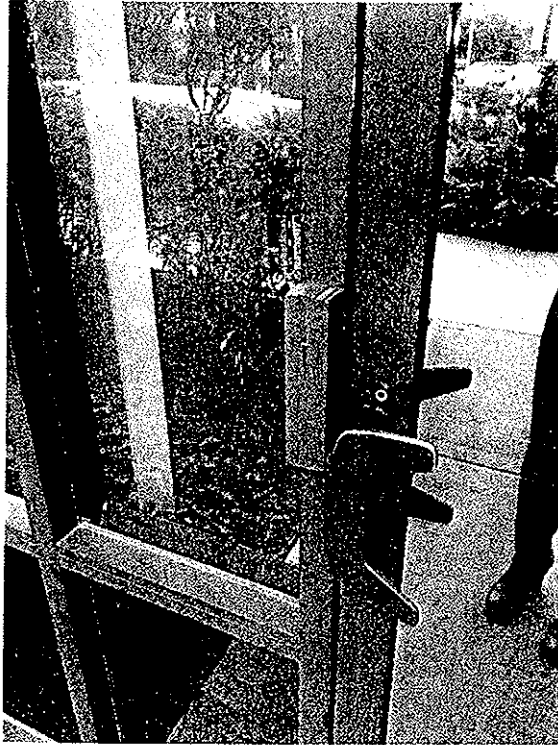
All exterior doors are not open to the public and require a UCSF issued security access card to gain entry.
